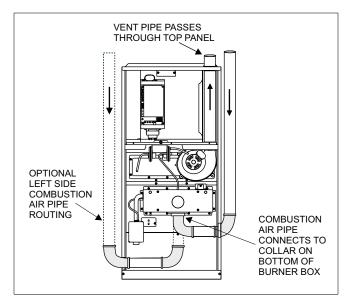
Air Intake and Vent Locations - Downflow/Horizontal
